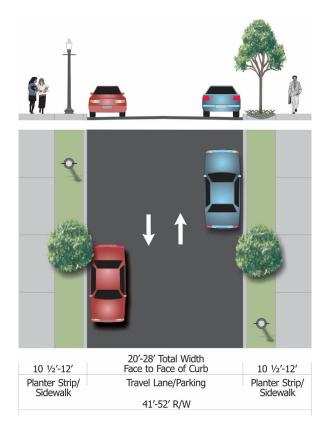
LOCAL STREET CROSS-SECTION
